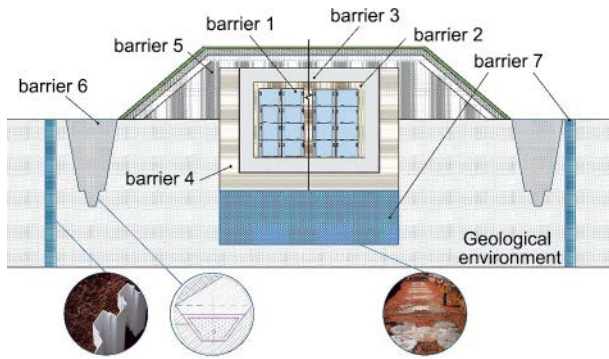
The system of engineered safety barriers in a repository: barrier 1 – containers with RW, barrier 2 – buffer material based on natural clays backfilling the voids in the disposal chamber, barrier 2 – concrete structures of walls, bottom and roof, barrier 4 – underlying cap, barrier 5 – covering waterproofing layer, barrier 6 – additional – drainage system, 7 – additional waterproofing barrier installed if needed
